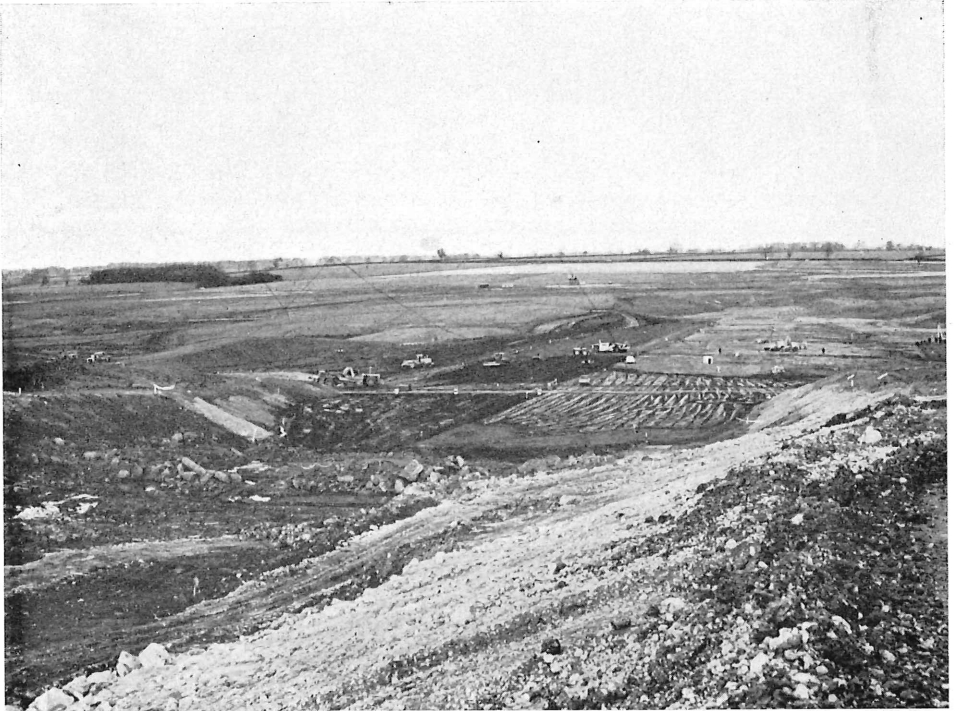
View of Empingham dam during construction from broad cutoff trench on right bank.
